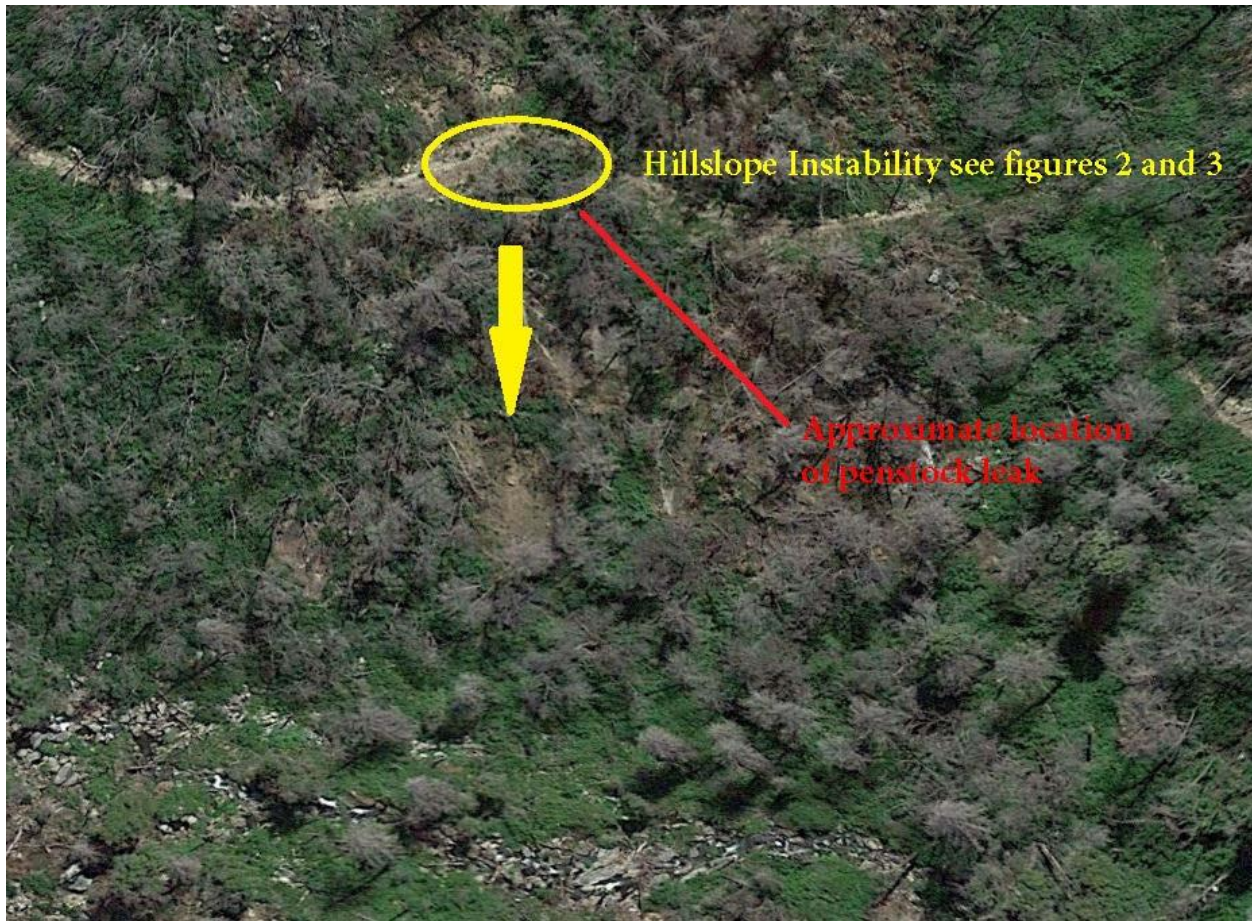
Aerial of hillslope instability near penstock leak. (Photo taken from Google Earth dated May 11, 2021)
